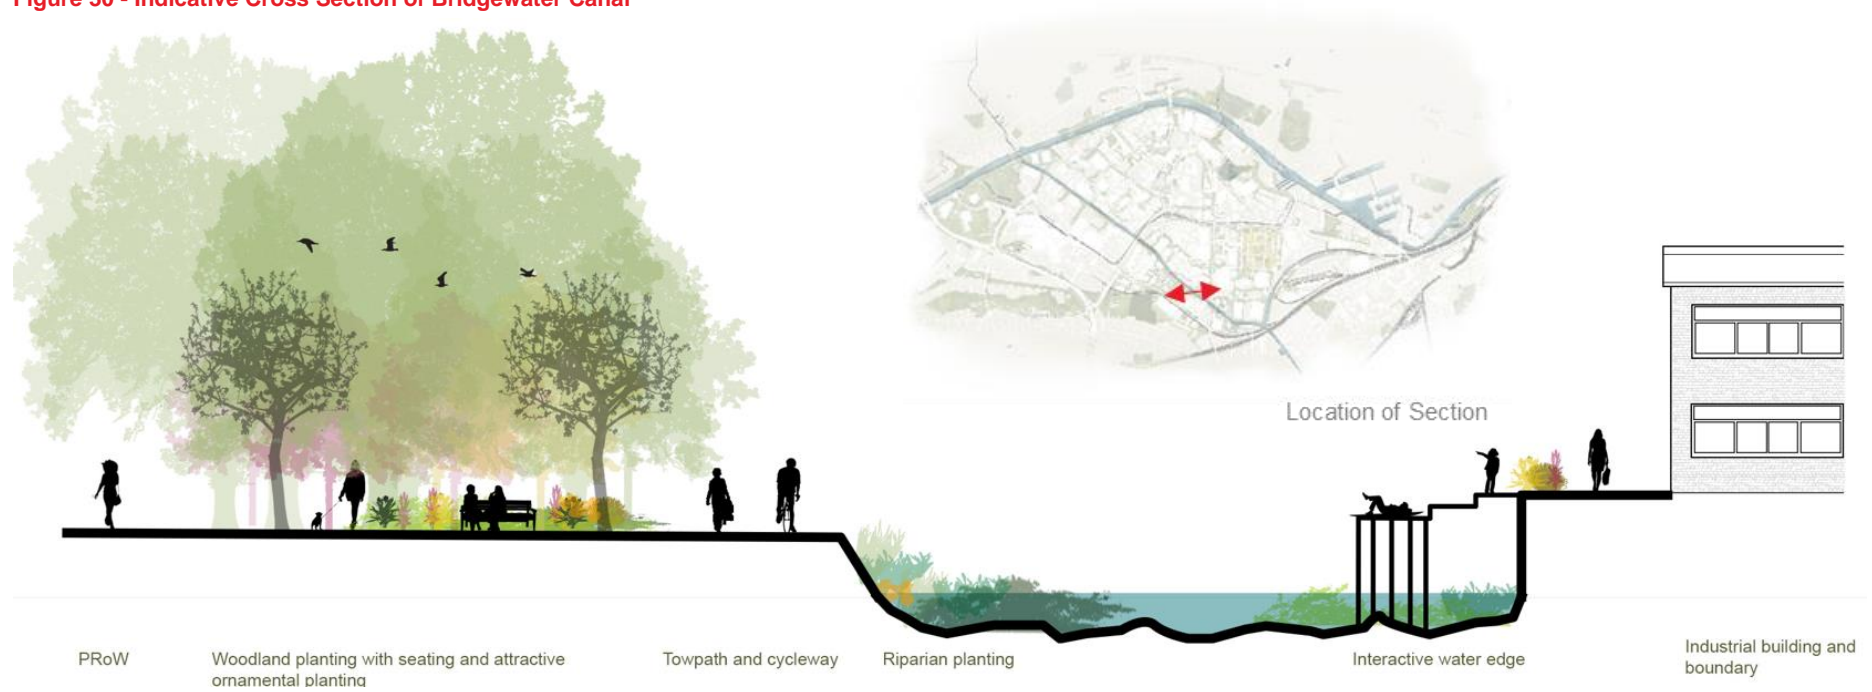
presents an indicative cross section of how the Bridgewater Canal could look in the future.
